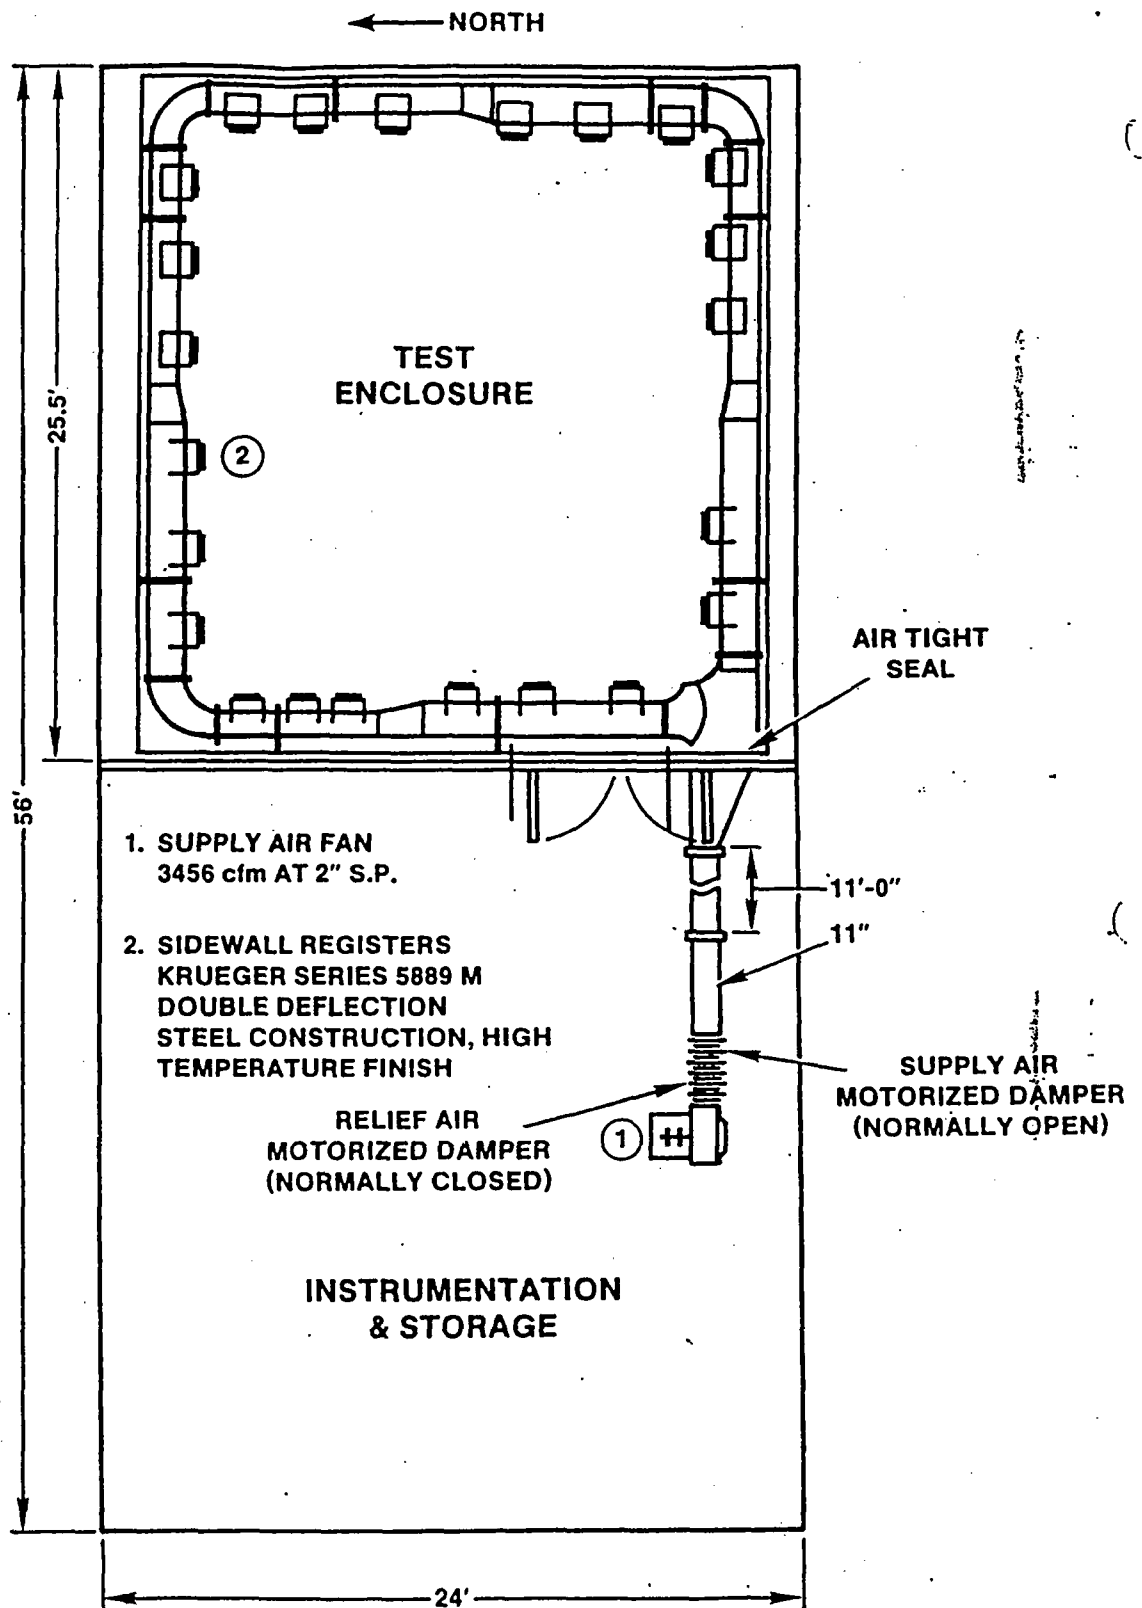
Floor Plan of the SNLA Fire Test Facility
